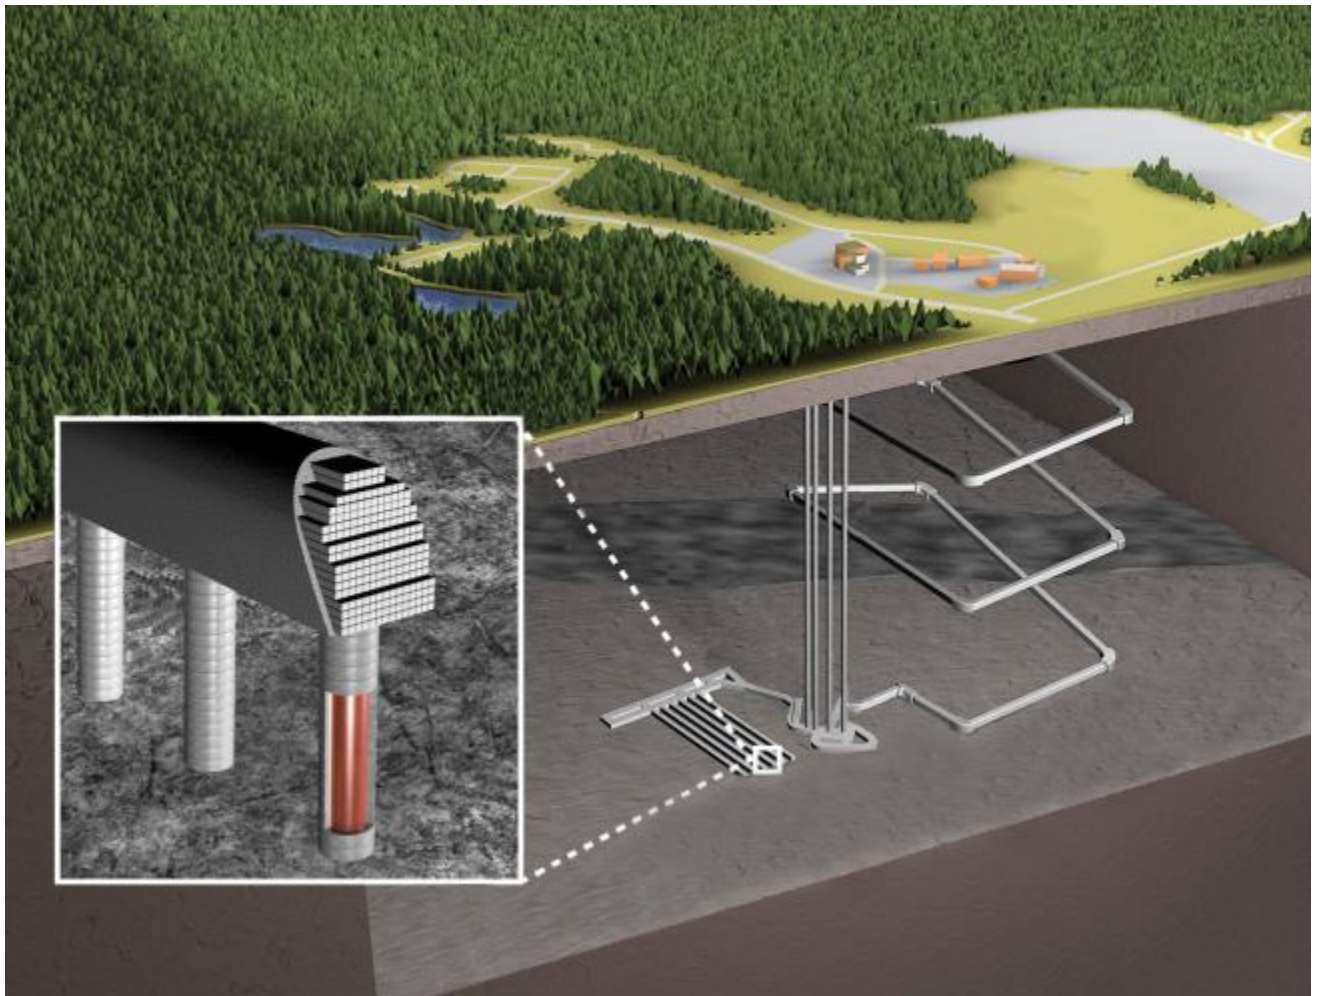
Illustration of the encapsulation plant and final disposal facility. Structures above ground include the encapsulation plant, a ventilation building, a hoist building, research and office facilities, and maintenance and storage halls. The underground final disposal facility will consist of the final disposal tunnels, central tunnels, and underground auxiliary technical facilities, among others. A vehicle tunnel and vertical shafts, such as a personnel shaft, a canister shaft, and ventilation shafts, will go from ground level to the final disposal facility. The close-up shows a filled final disposal tunnel and a copper disposal canister (in red) surrounded by bentonite. Image by Posiva Oy (edited).
